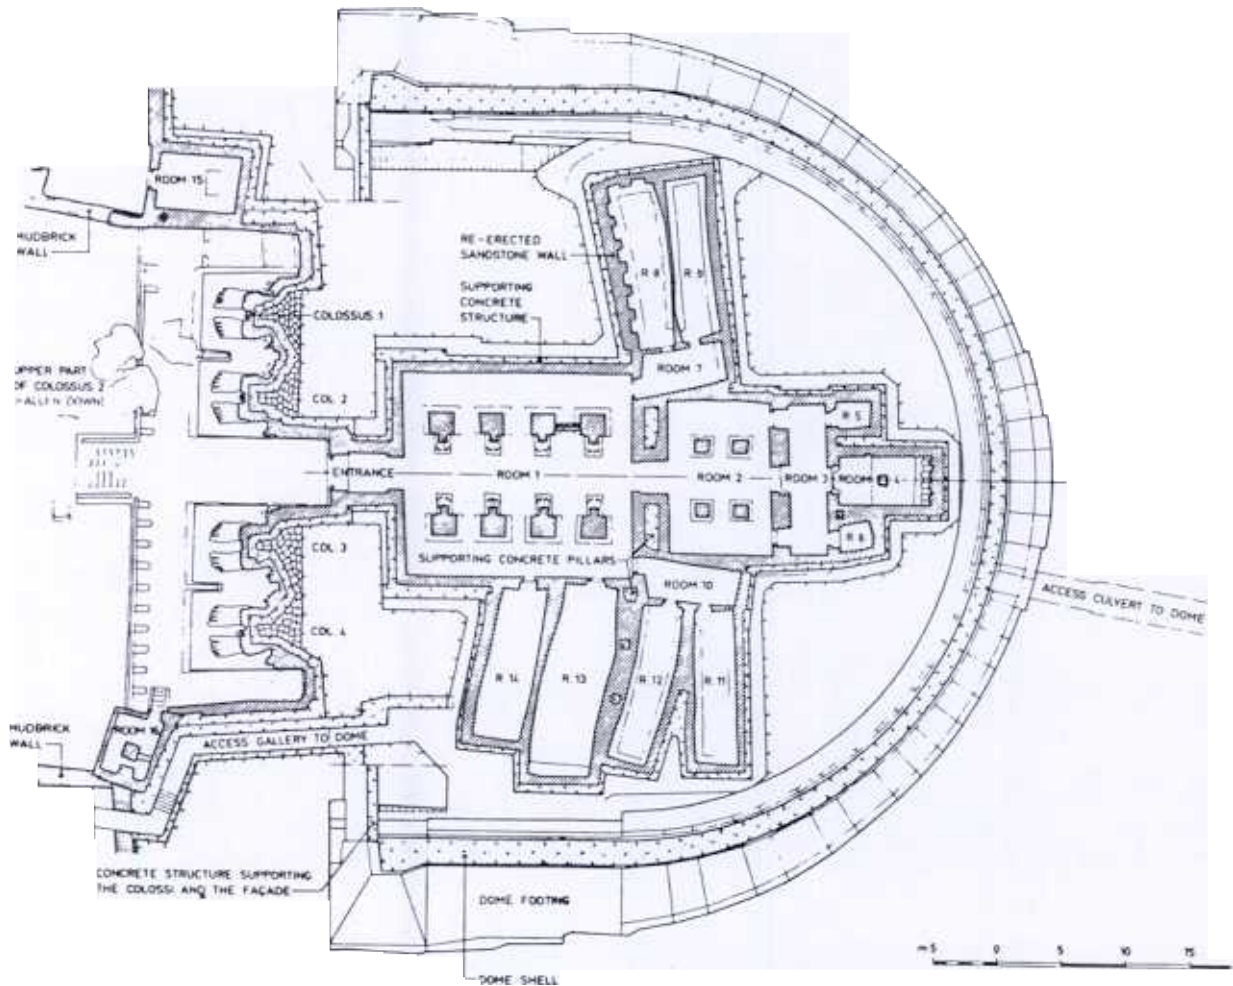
Horizontal section of the Great Temple showing the re-erected façade and rooms with their supporting concrete structures, as well as the surrounding concrete dome.
